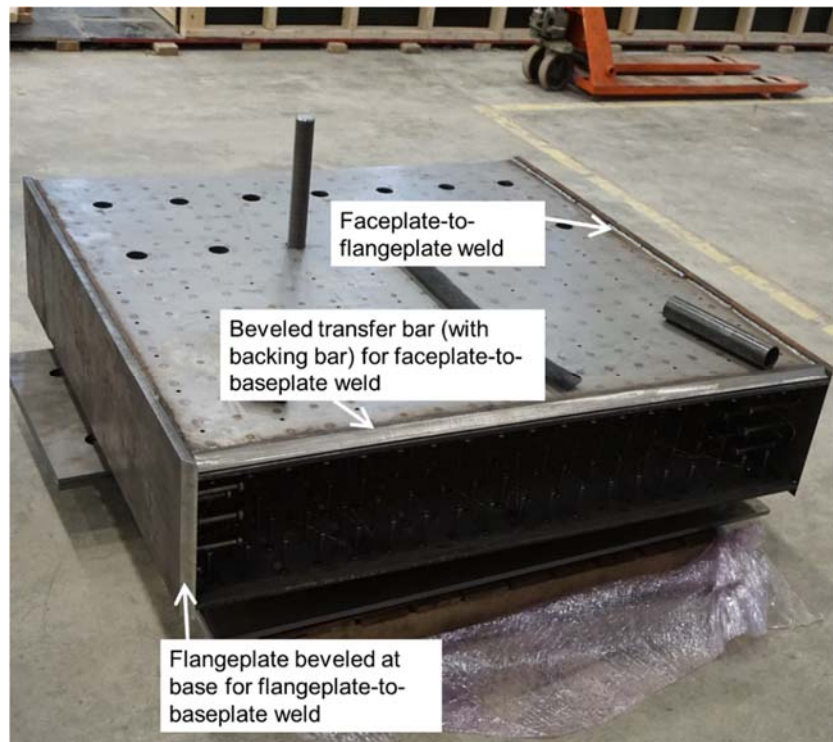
SC-W-H: Welded steel assembly
